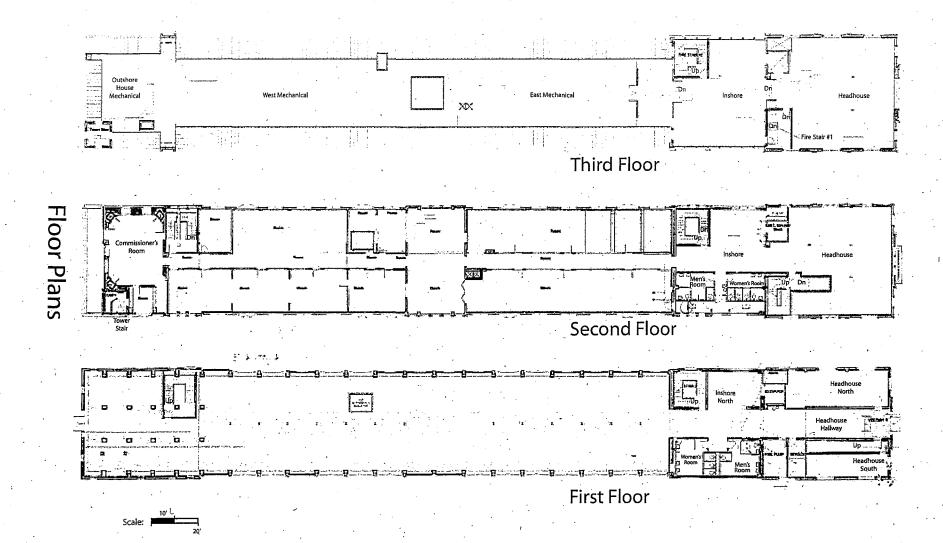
EXHIBIT B: TENANT'S PROPOSED USE OF PUBLIC AREAS
